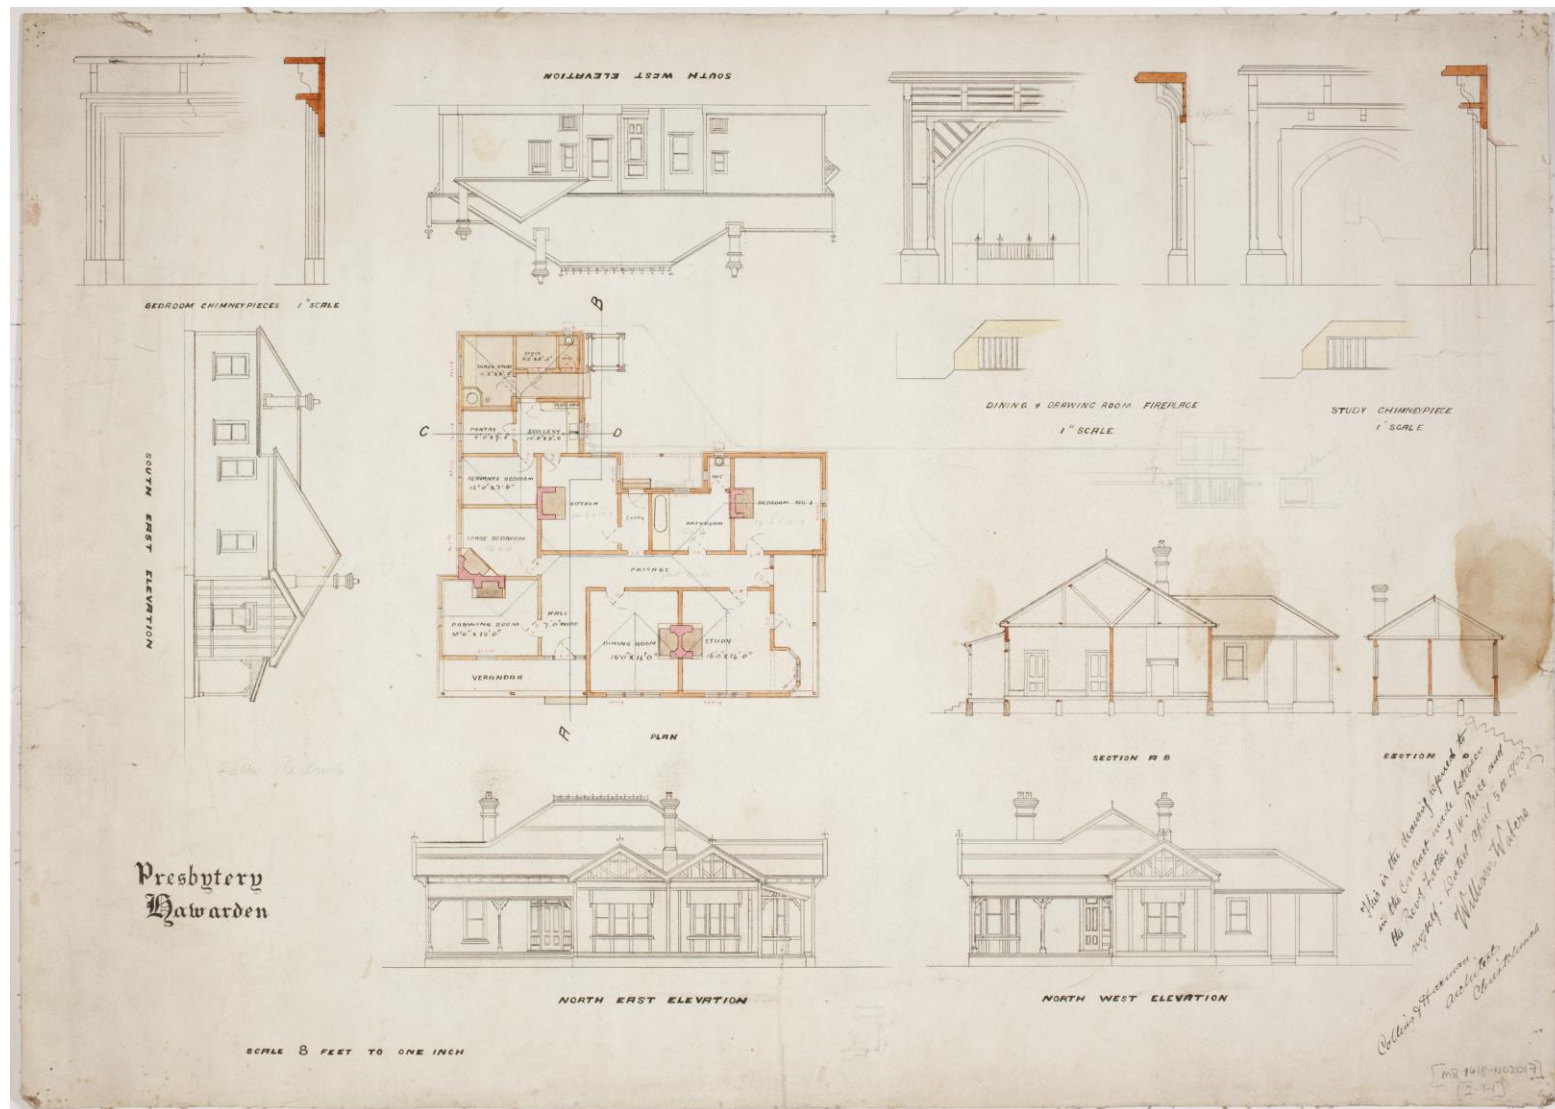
Collins and Harman, Presbytery, Hawarden, plan, elevations, sections and details (1900).
